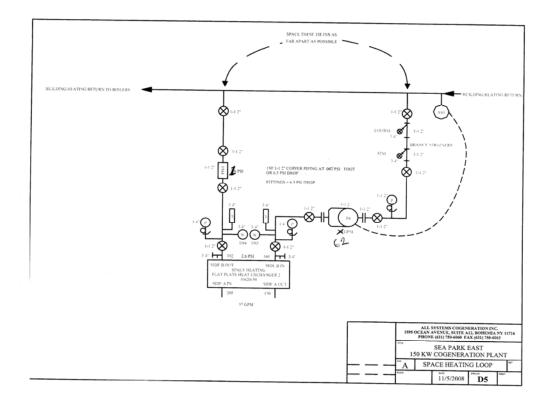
Connection of Space Heating HX into Building (Drawing D5)
